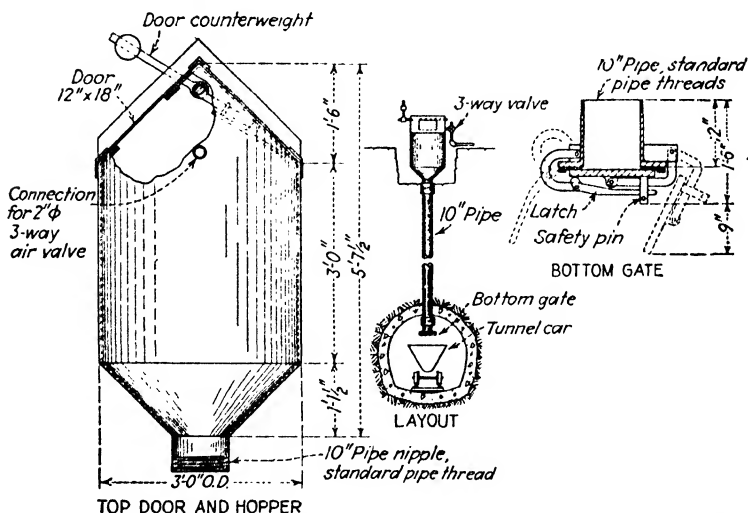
Concrete lock for passing concrete from the surface into a compressed air tunnel.
